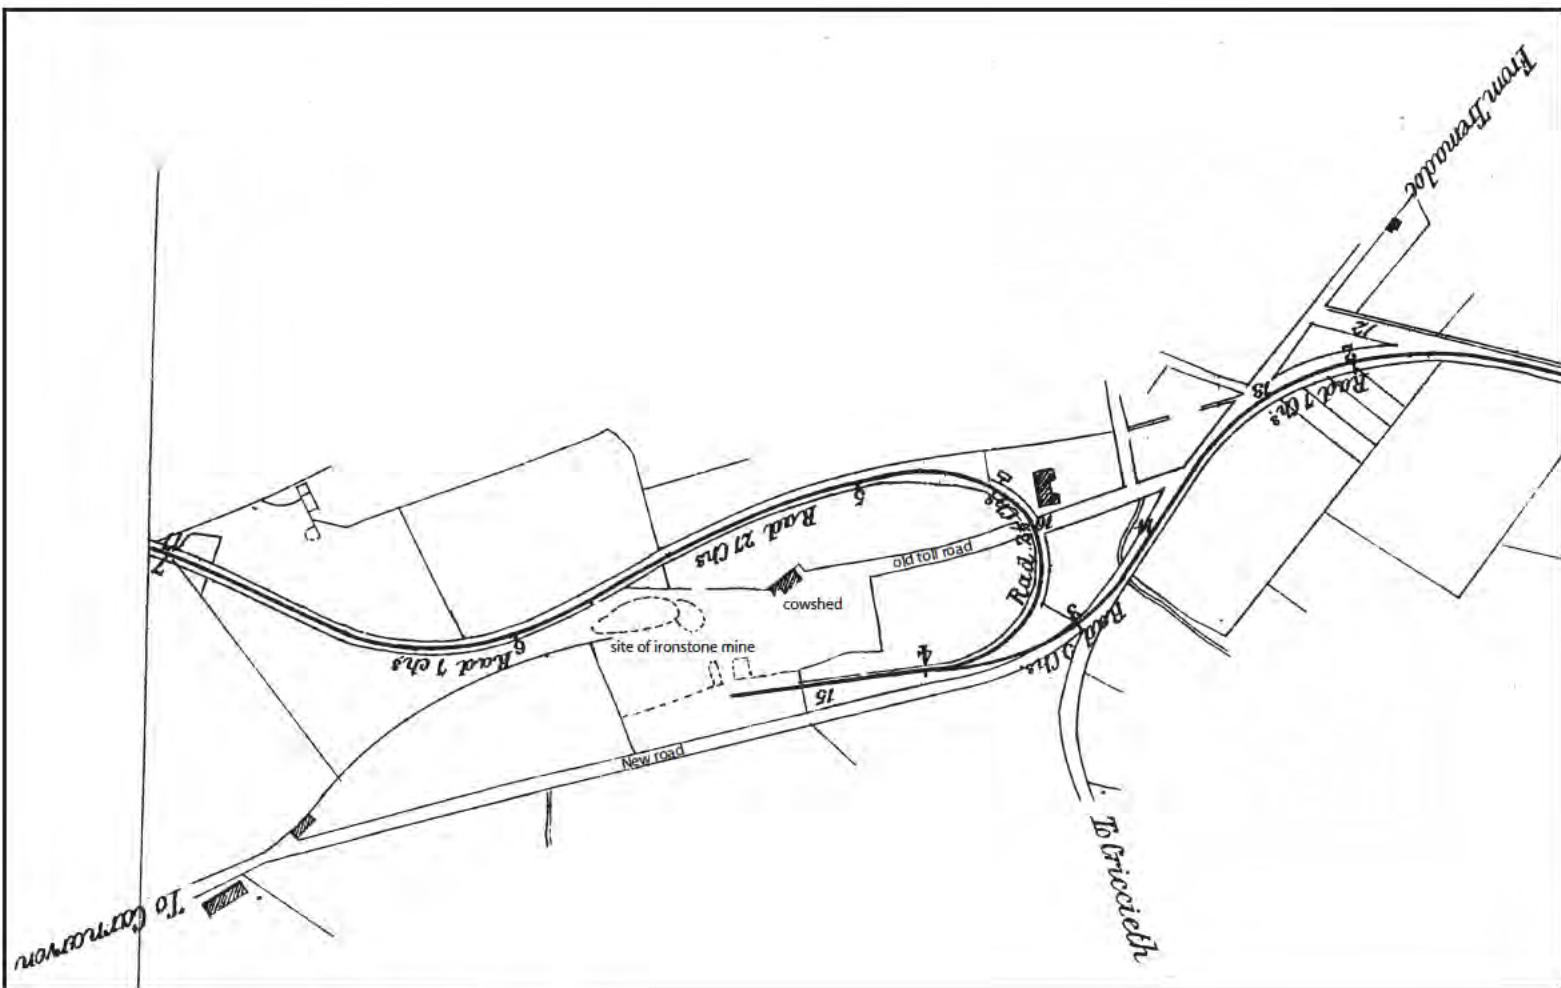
Plan of tramways in 1871 (CRO, X/Plans/R/69)
